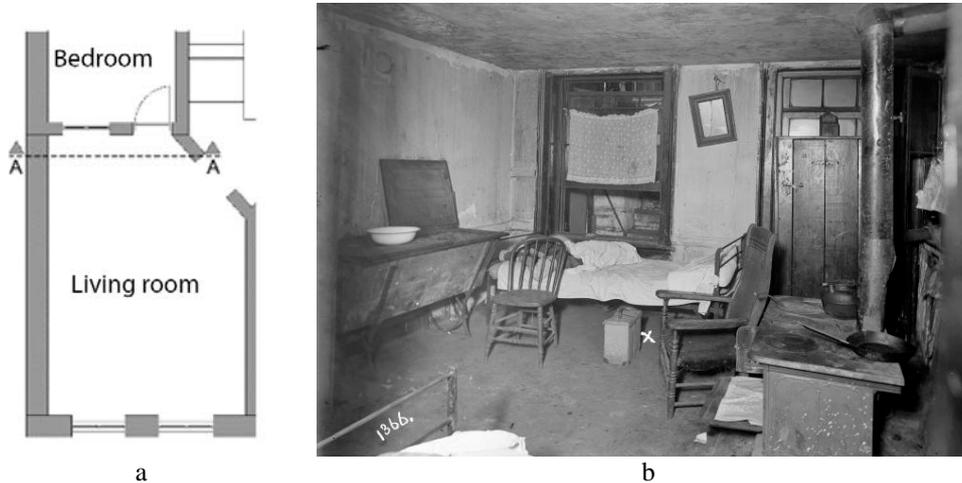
(a) Window plan opening from dark inner rooms to the living room (drawing by authors), and (b) Minimum 30 cm² opening above the door and minimum 0.90 m² window opening from the dark room to the front room (URL-4)
